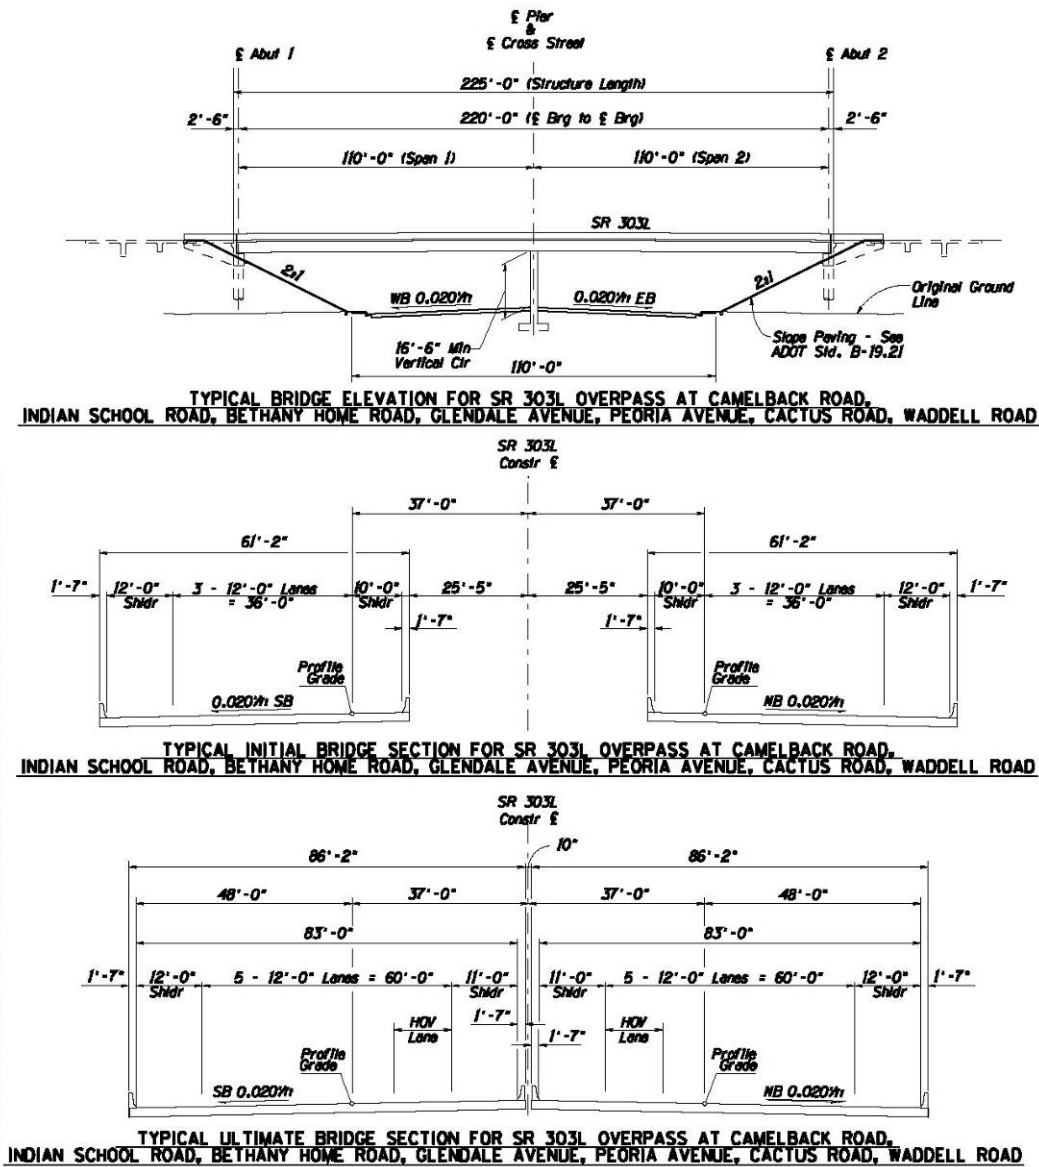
Elevation and Typical Overpass Bridge for SR 303L
